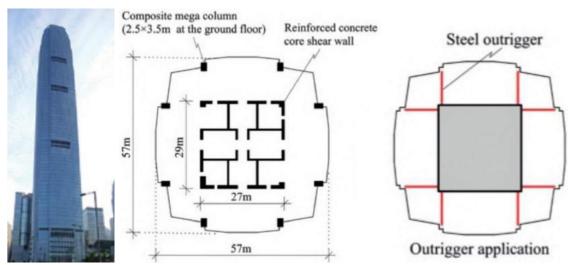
Steel and Reinforced Concrete Construction of the Two International Finance Center, Hong Kong
